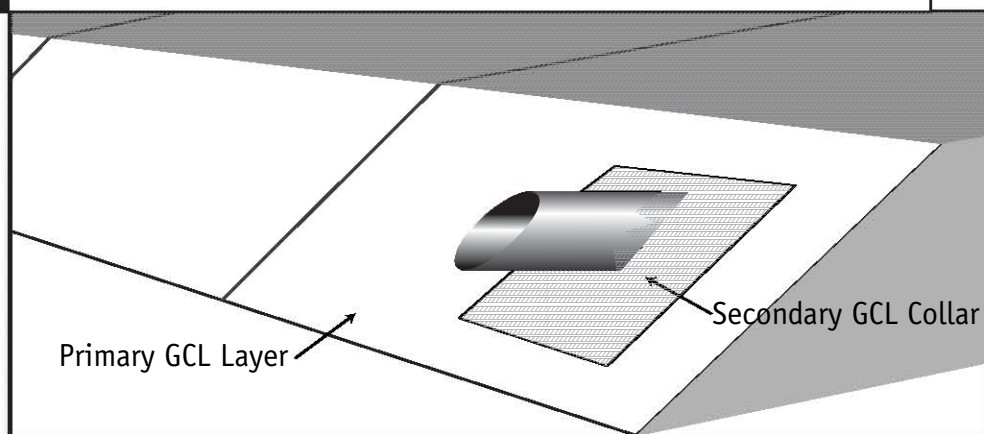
A CROSS-SECTION OF A HORIZONTAL PIPE PENETRATION
